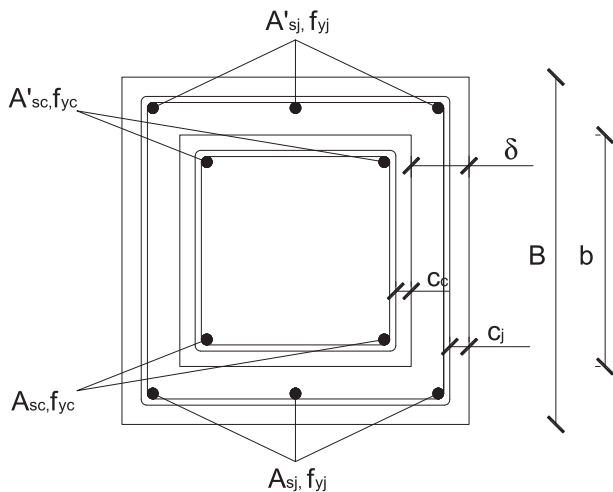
Case study: square RC section reinforced with a RC jacket.
